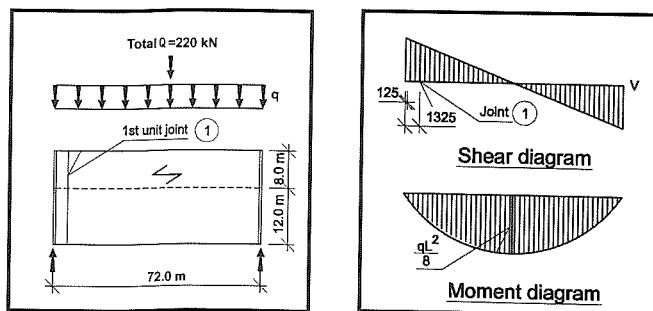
Examples Of Shear Transfer Along Longitudinal Joint Between Elements In Floor Diaphragm Design
